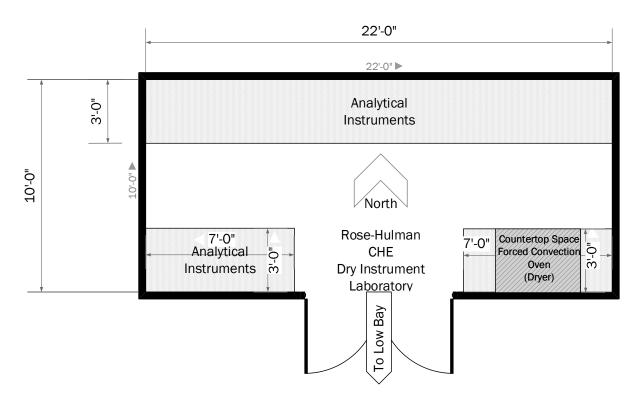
Dry Instrument Laboratory (O-102B) Floor Plan
